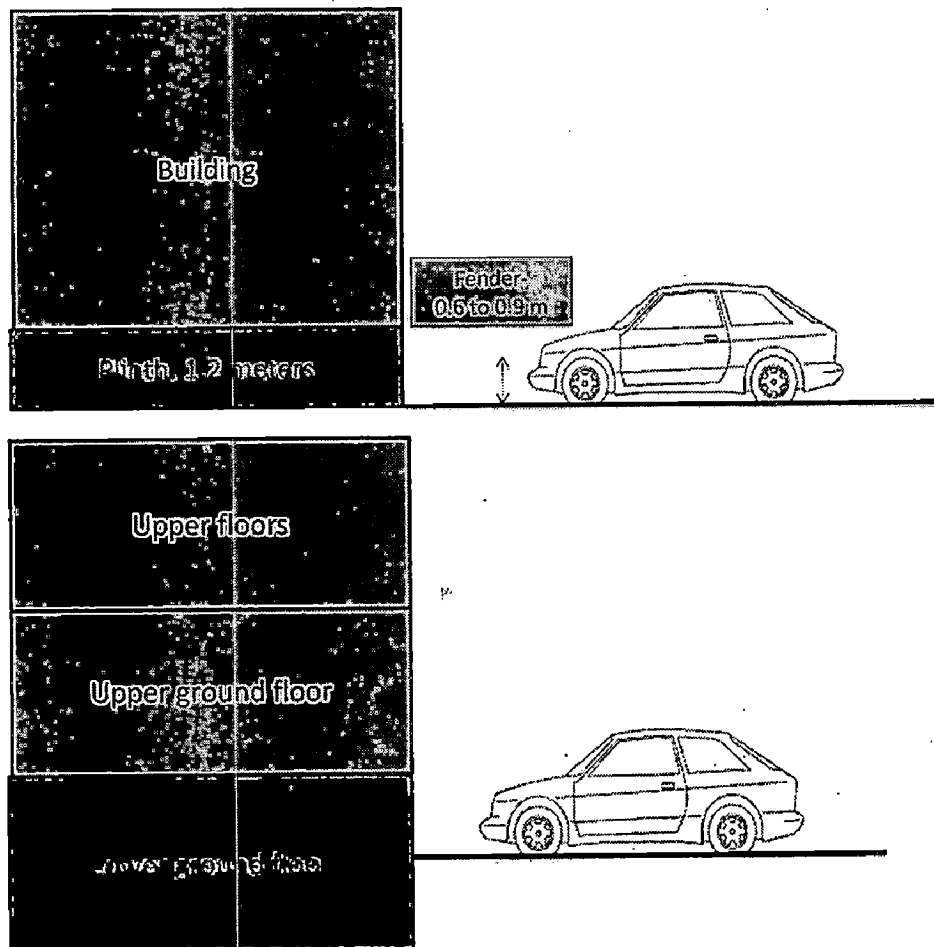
Plinth level of the building should be placed at least 1.2m above the ground. This raised platform can also be achieved by providing activities in lower ground floor or basement.
